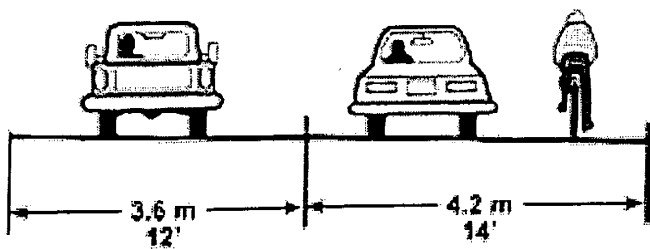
Cross-section of a wide curb lane (Source: Oregon Department of Transportation)
